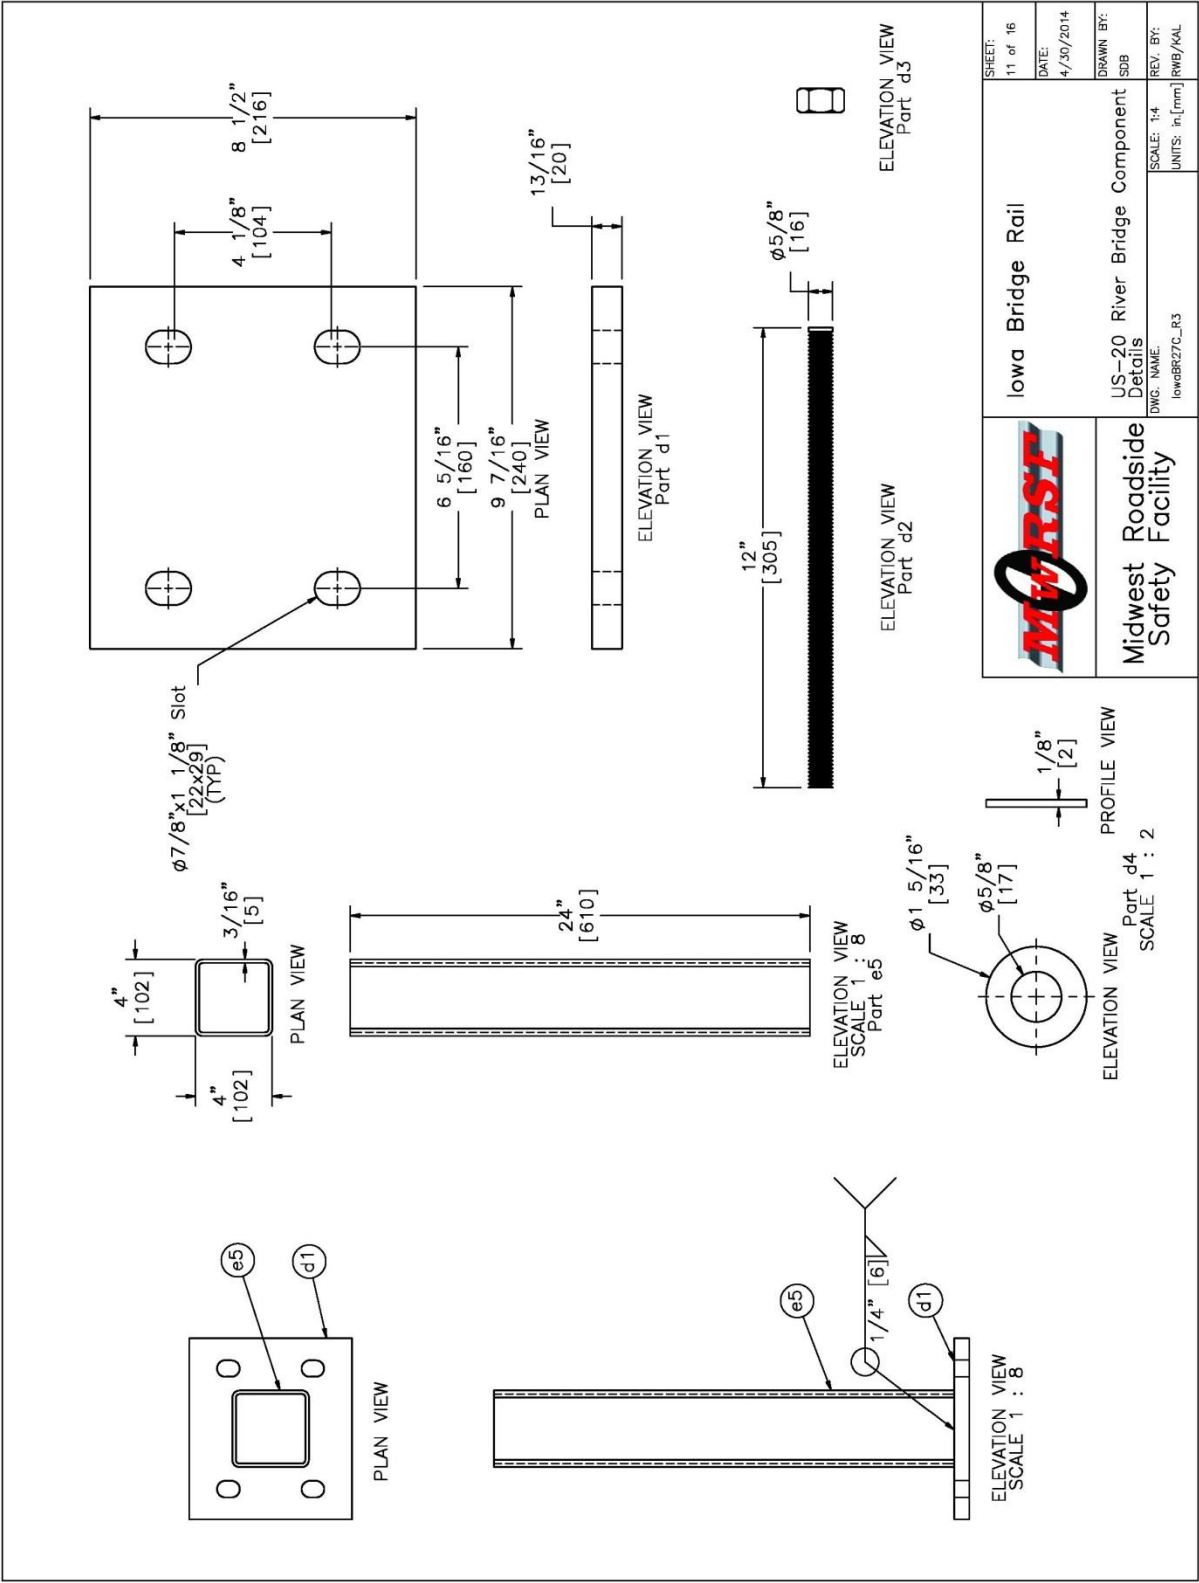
US-20 River Bridge Component Details, Test No. IBP-4
